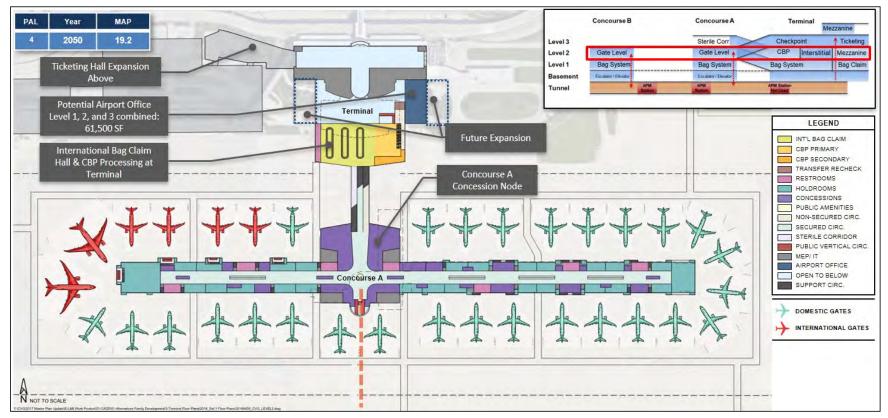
PAL 4 ENLARGED FLOOR PLAN – LEVEL 2 TERMINAL AND CONCOURSE A
